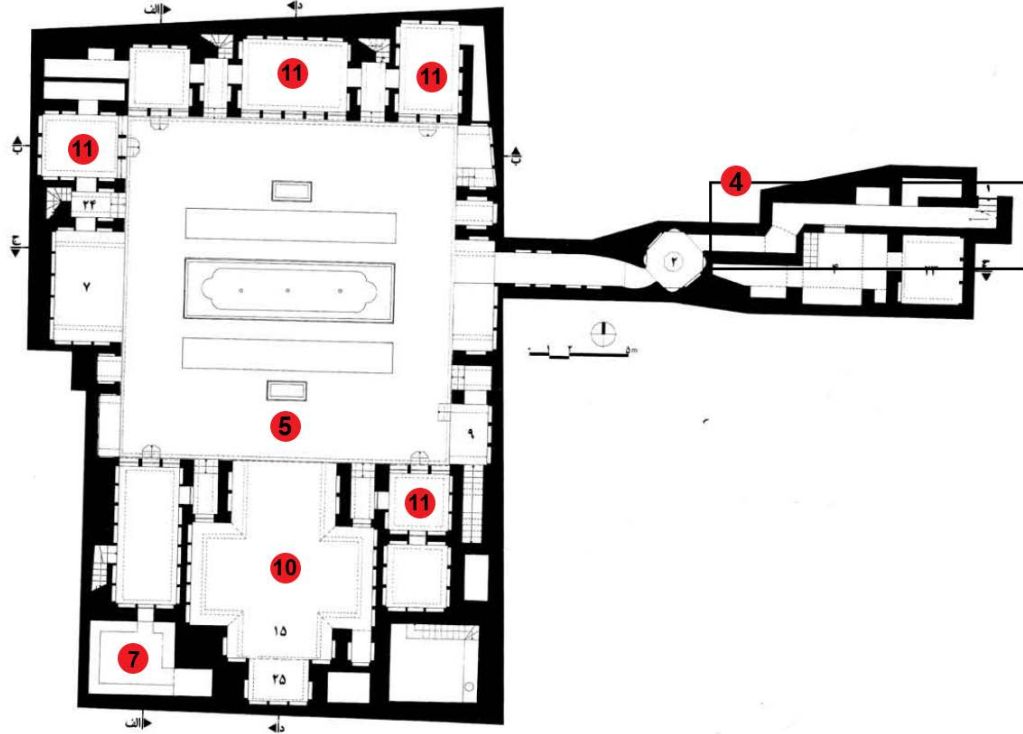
Plan of the first story of Semsar yazd House, Yazd Houses Treasure Book 2004
